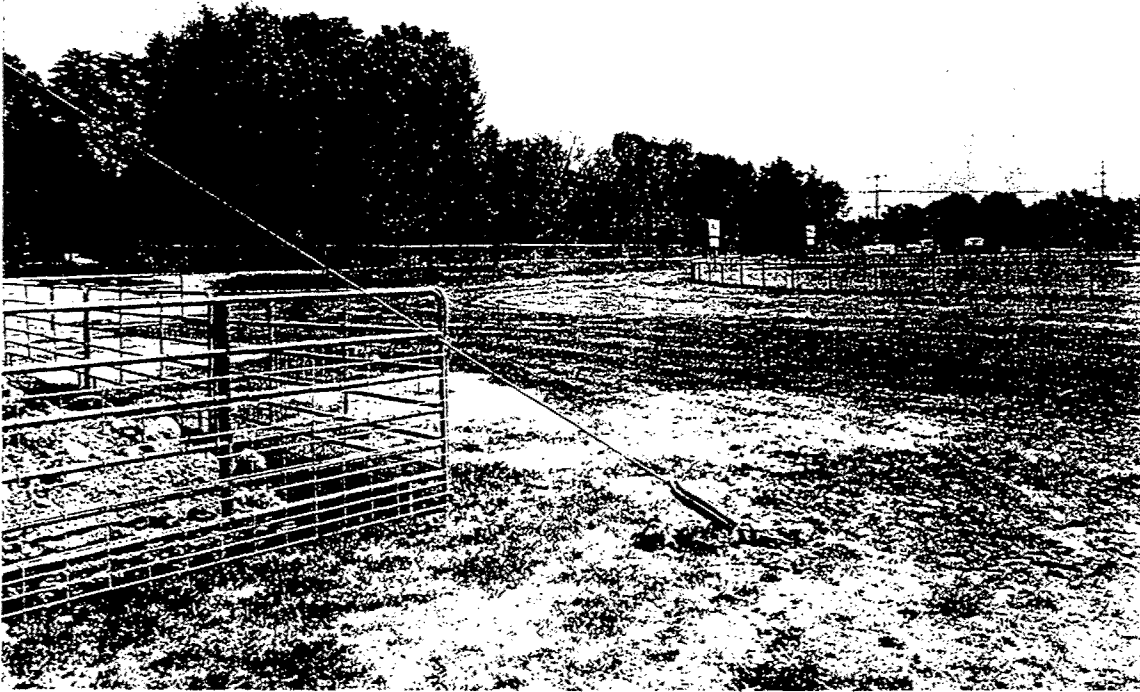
Site 2 - Reach 2 - Left Bank - Looking Downstream. Scour Area
